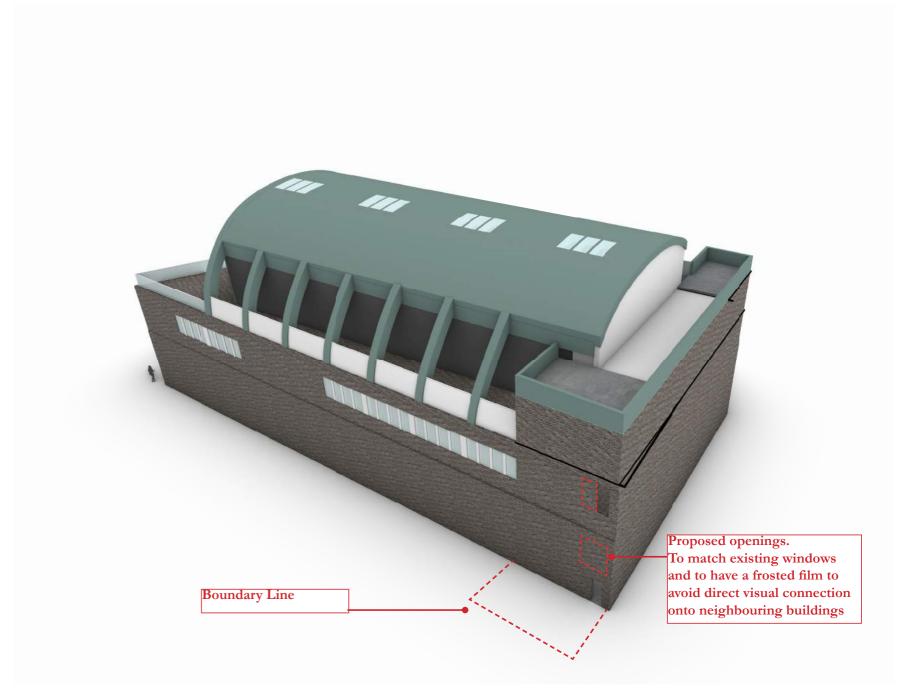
Axonometric showing proposed enlarged existing and new window
